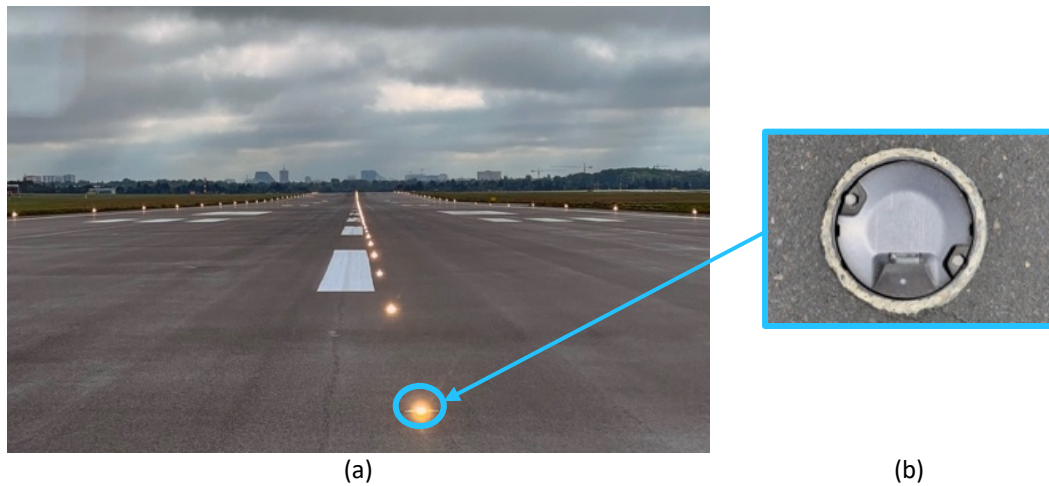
Runway view with lighting and line markings (a) and in-pavement airport lamp (b) [31]
